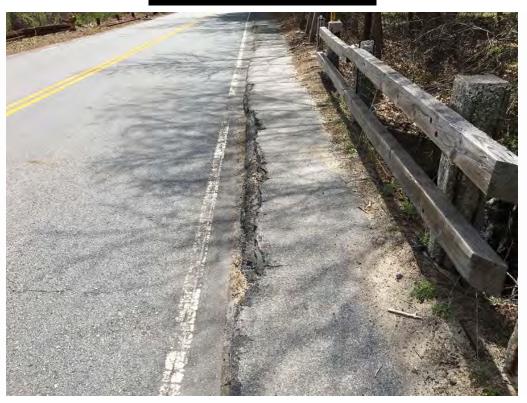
West sidewalk, deterioration at the curb which is propagating into the sidewalk.
